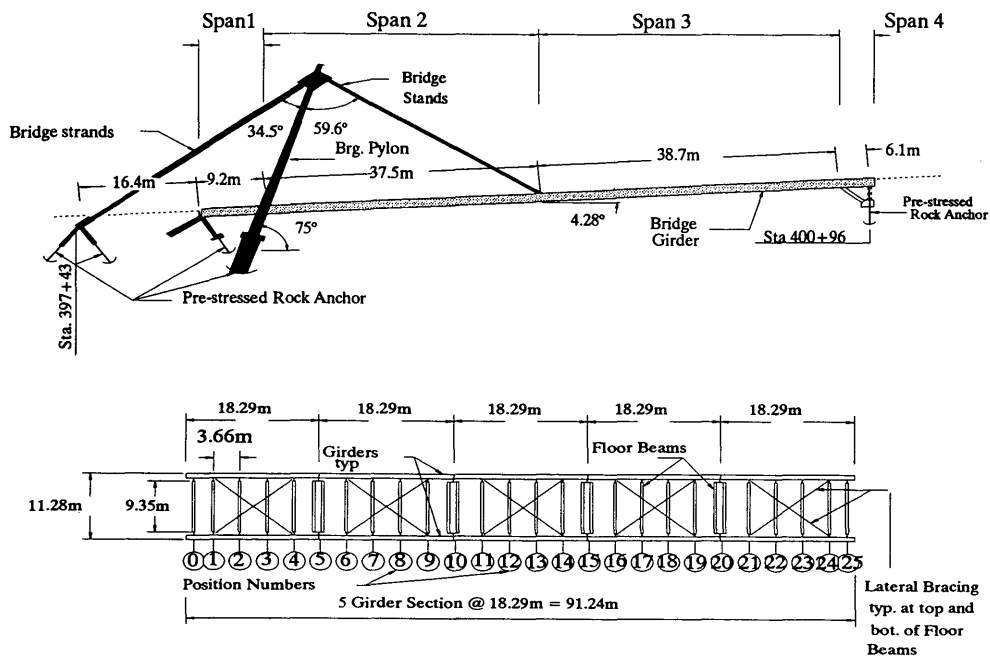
Captain William Moore Creek bridge geometry: *top*, bridge geometry elevation; *bottom*, bridge frame plan view.
